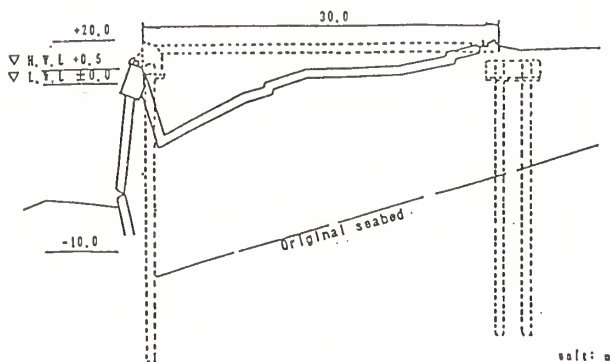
Cross section of damage to steel sheet pile bulkhead (Ohama No. 2) in Akita Port
